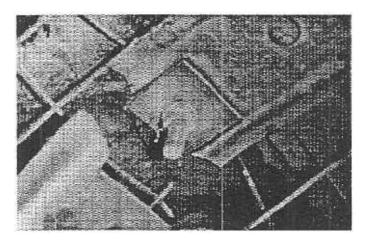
Square bearing plate has cut through the W Strap causing it to fail completely.
